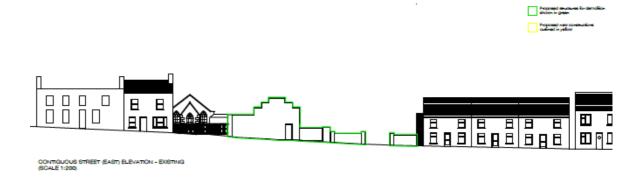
Contiguous Existing Street Elevation of the two facilities on Patrick Street, Regional Road R639
